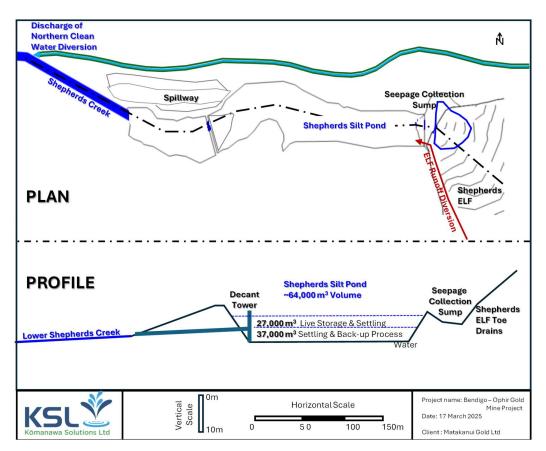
Schematic plan and profile of the Shepherds Silt Pond
